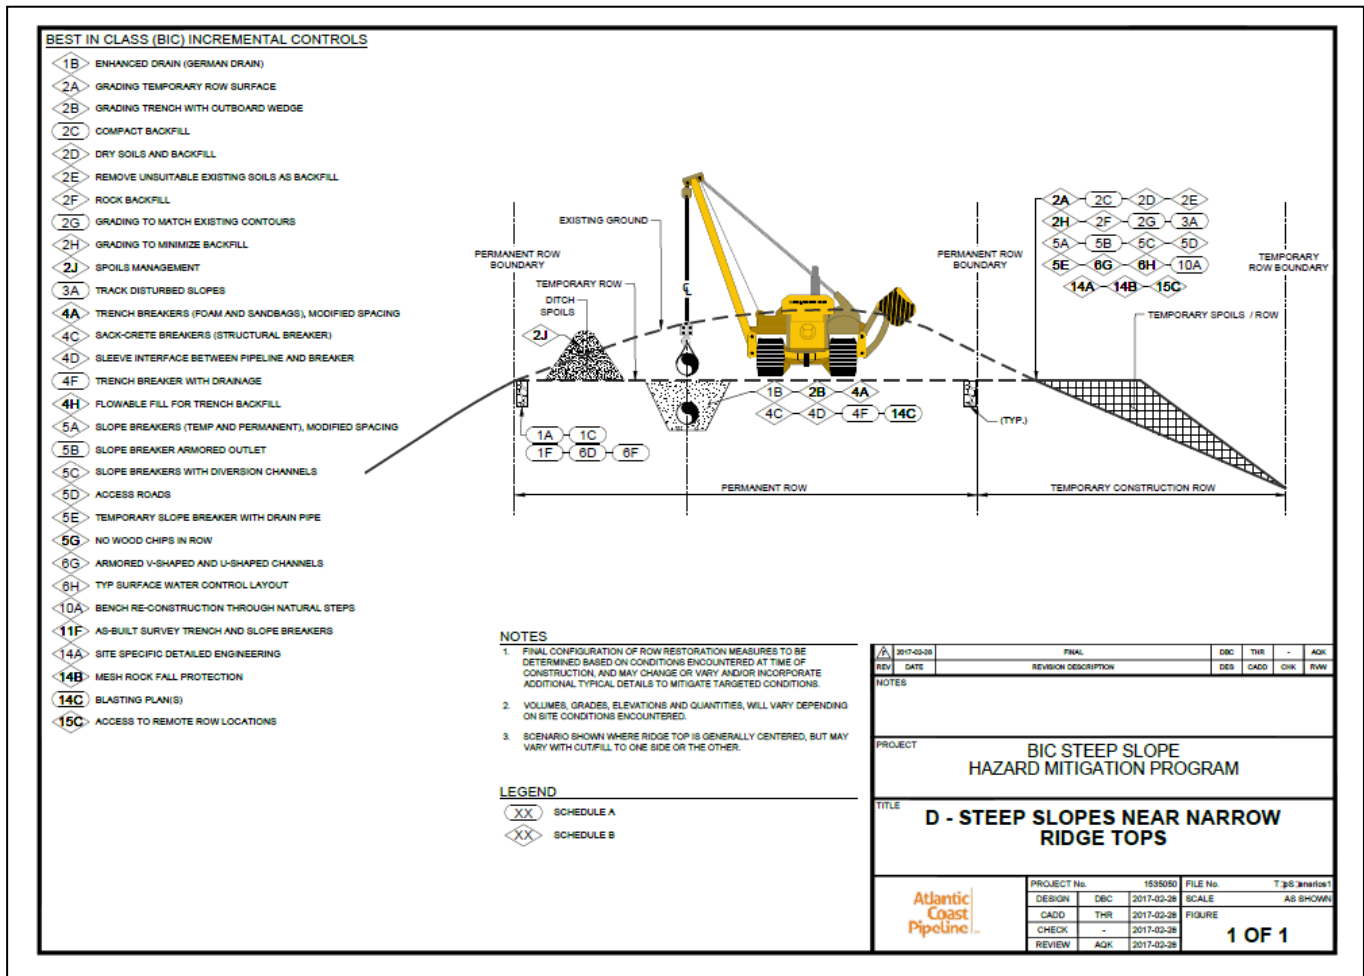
ACP typical section demonstrating removal of elevated areas along the proposed ACP construction areas to create level work areas. This schematic diagram is excerpted from the ACP SWPPP submitted to the WVDEP.
